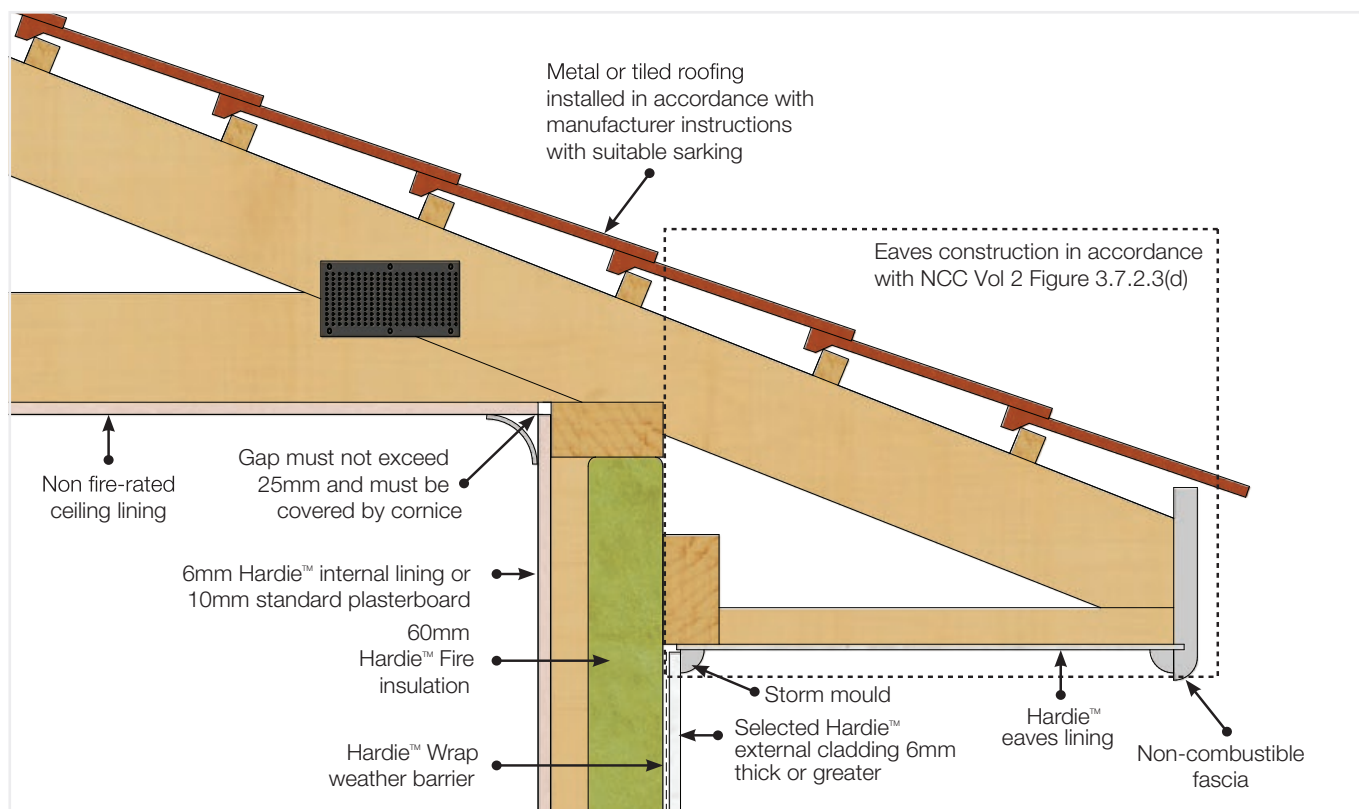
EXTERNAL BOUNDARY WALL TO HARDIE™ EAVE LINING
